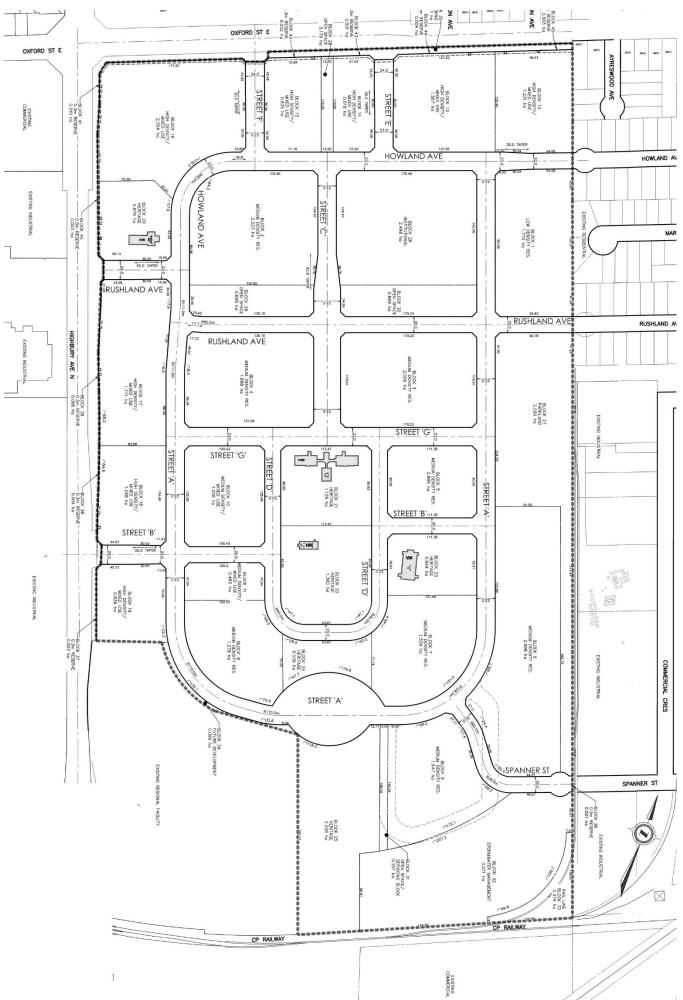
Excerpt from Revised Draft Plan of Subdivision for 850 Highbury Avenue North
